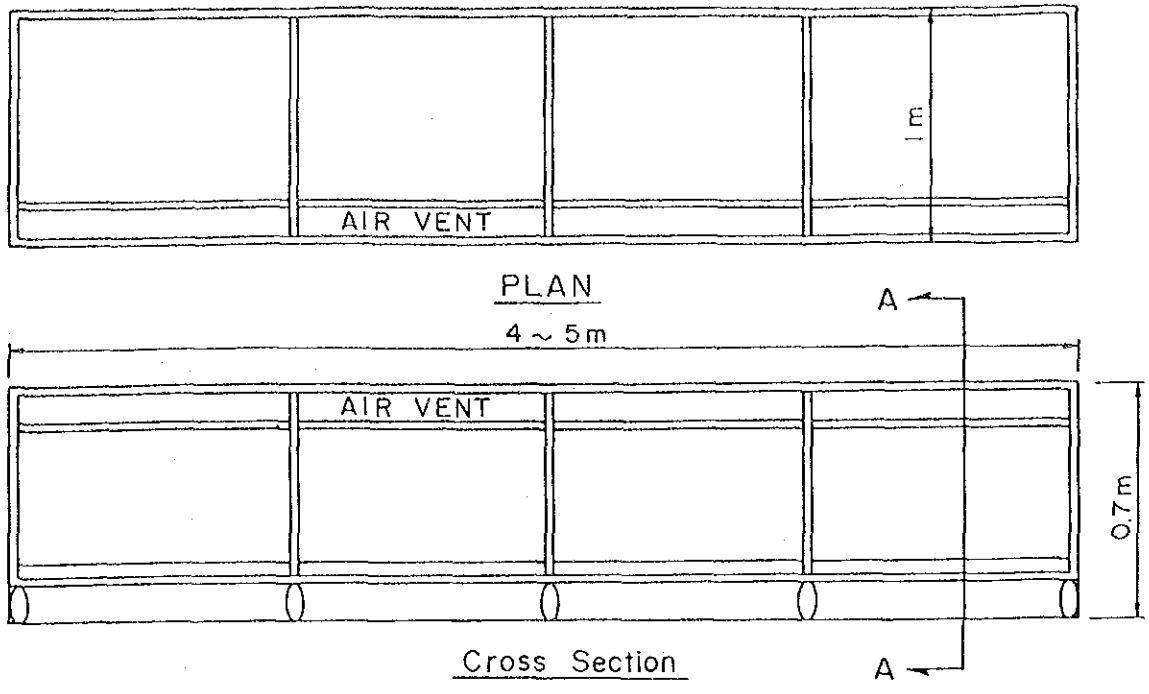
SOLAR DRYER - SKETCH PLAN
